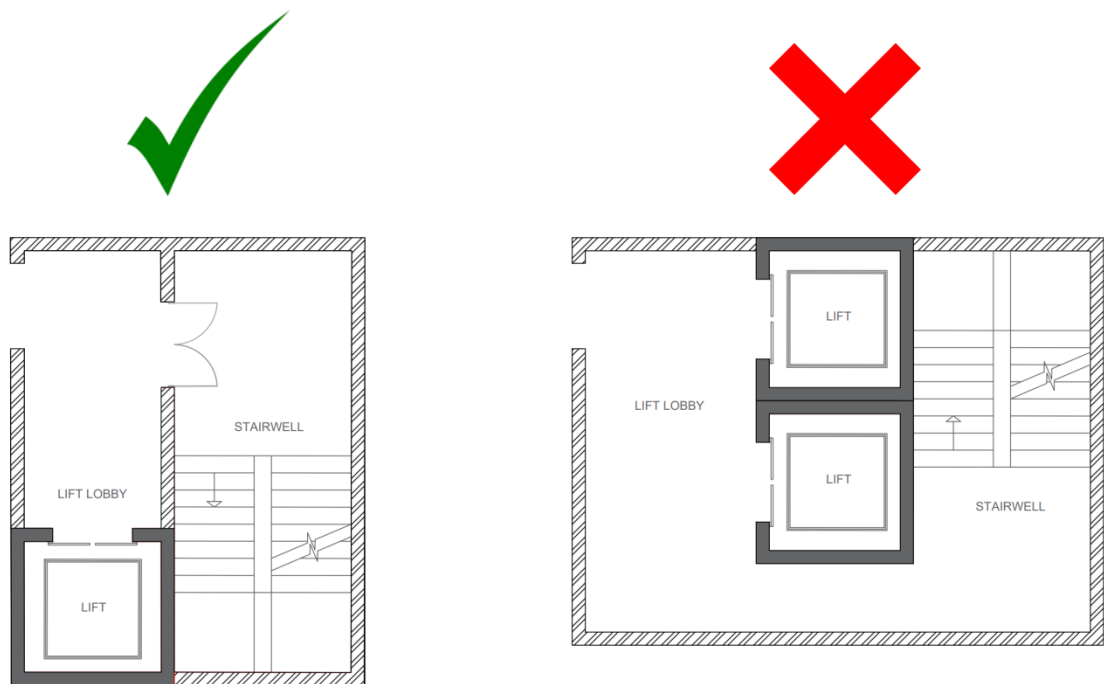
Acceptable stairway layout (L) and unacceptable stairway layout (R)
